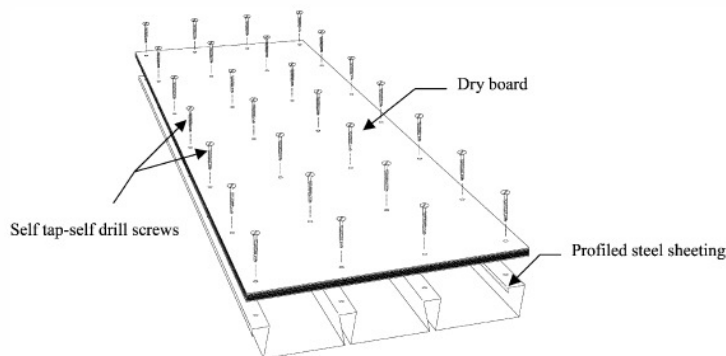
Profiled Steel Sheet Dry Board Floor Panel.
